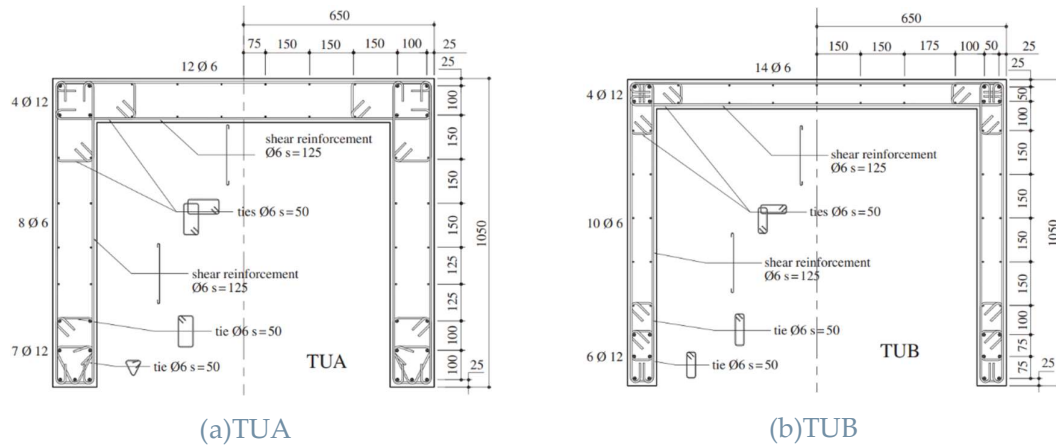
Cross section of the test specimen by (Beyer et al., 2008b) scale 1:2. Dimensions in mm.
